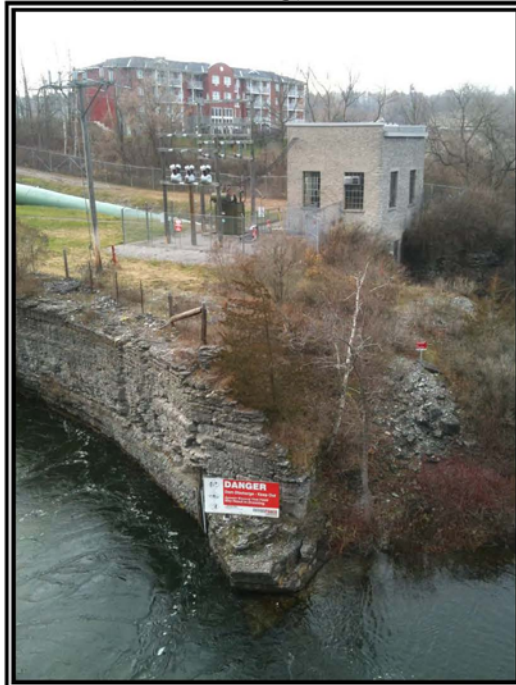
View to North of Main Powerhouse and Forebay (Upper Site).
